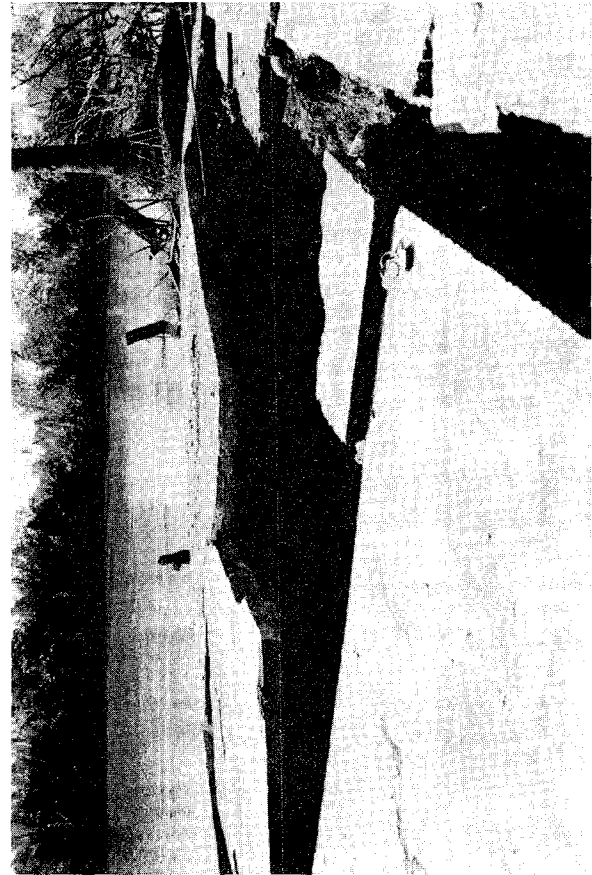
The concrete slab cracked due to the lateral spreading toward stream channel
